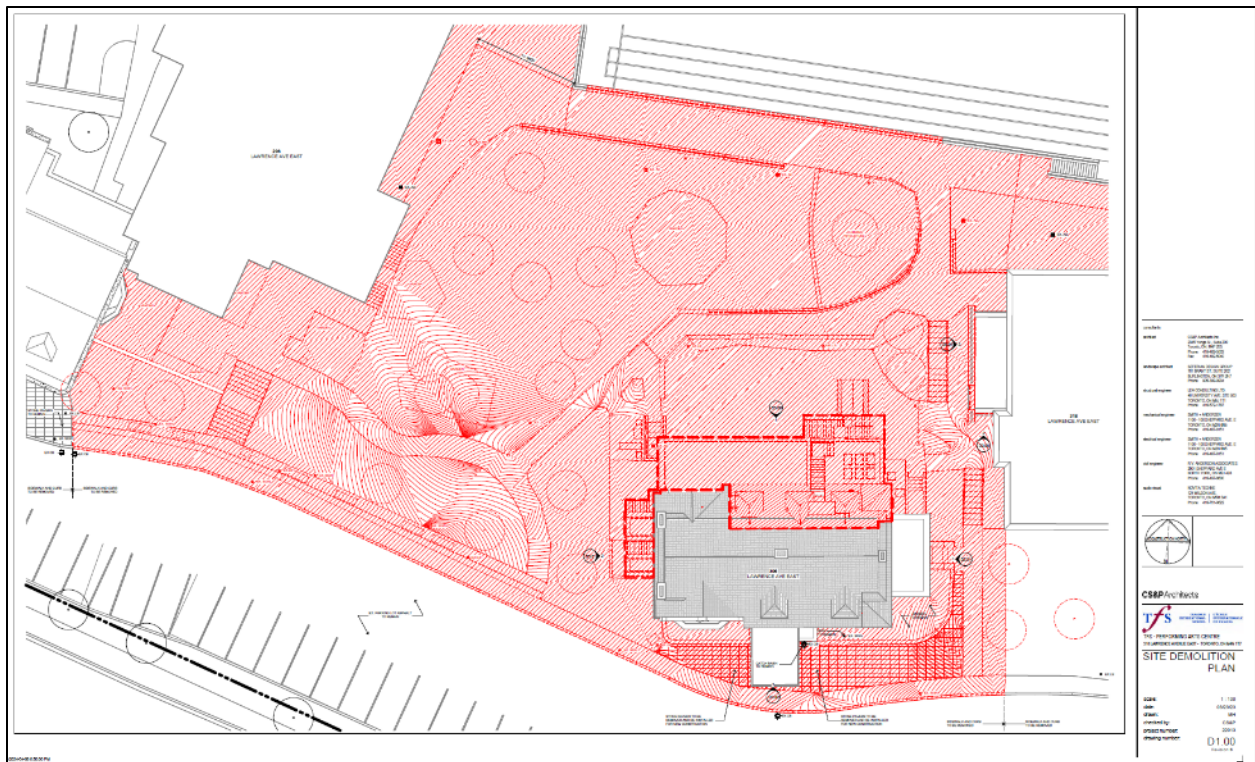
Site demolition plan (CS+P Architects, March 3, 2023).
